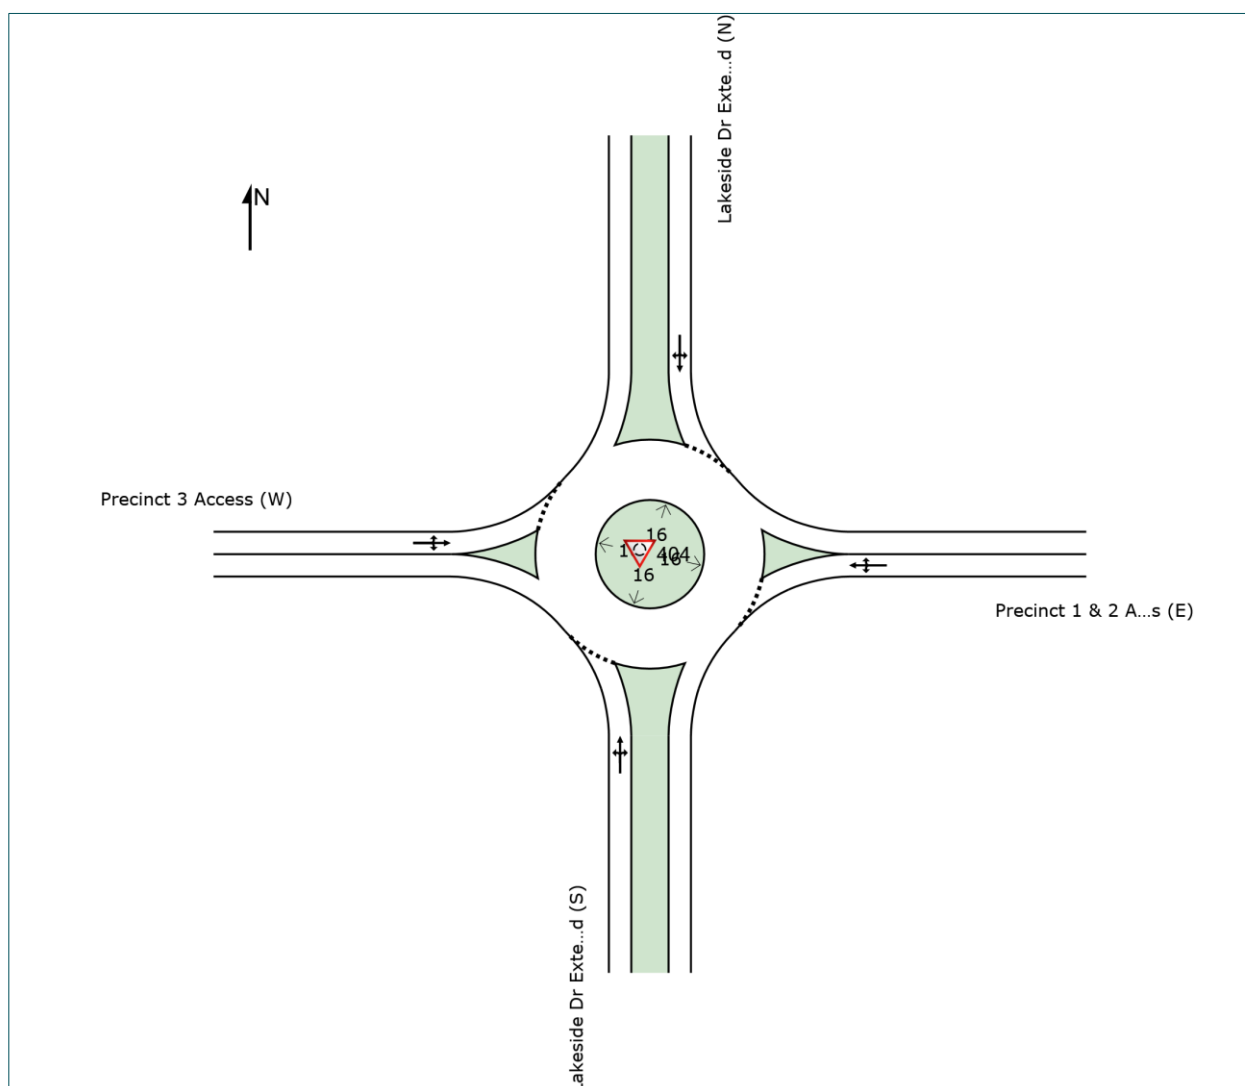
Proposed Lakeside Drive extended / Development Access roundabout SIDRA layout
